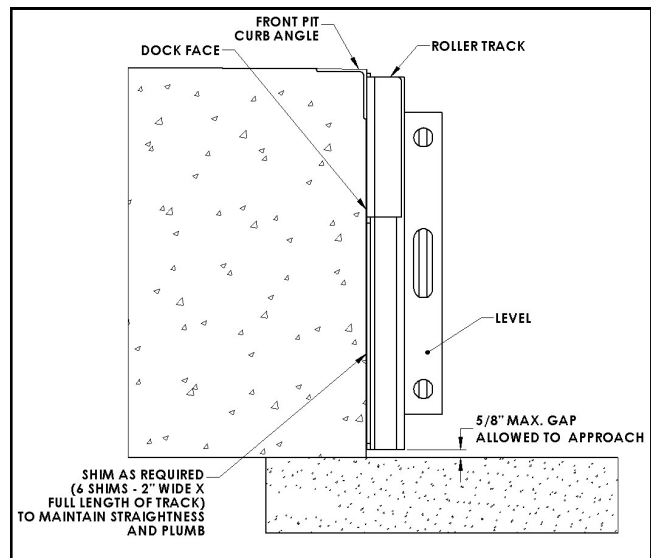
FIGURE D—WELDING ROLLER TRACK SIDE VIEW
